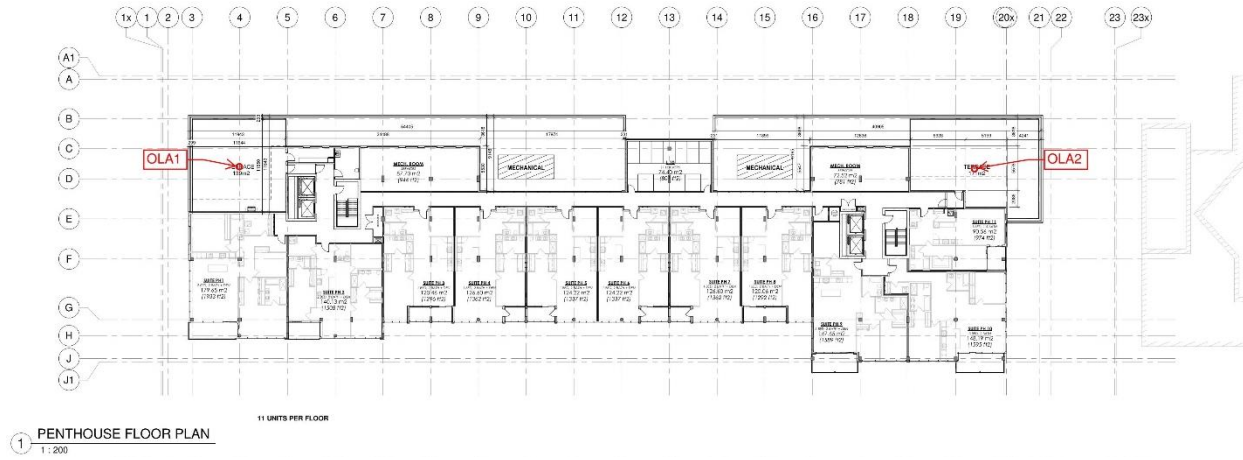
OLA1 and OLA2 Locations, 10th Floor (Penthouse)
